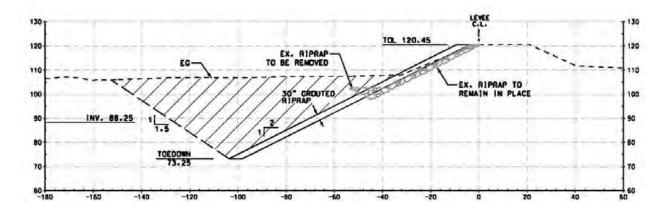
Typical Cross Section of Alternative F1 (Sta. 368+00)
